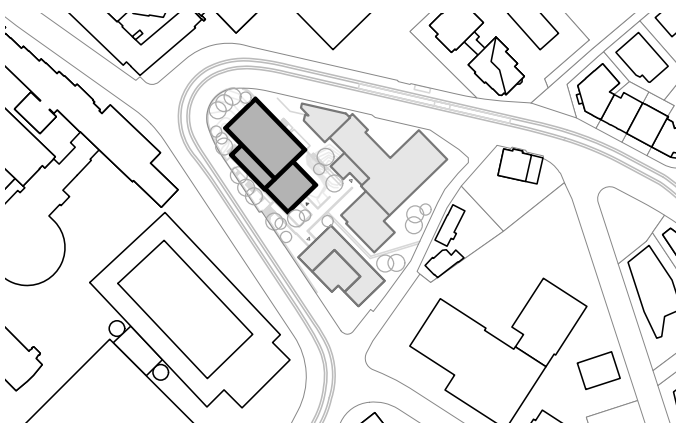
Site context plan (Itten+Brechbuhl AG)
